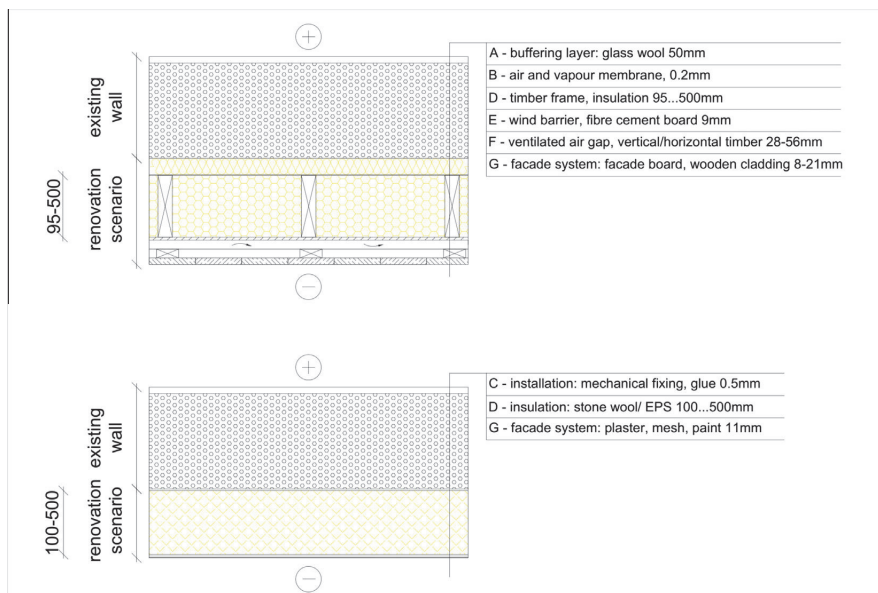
Examples of external wall renovation solutions. Above pre-fabricated timber element and below ETICS system.
